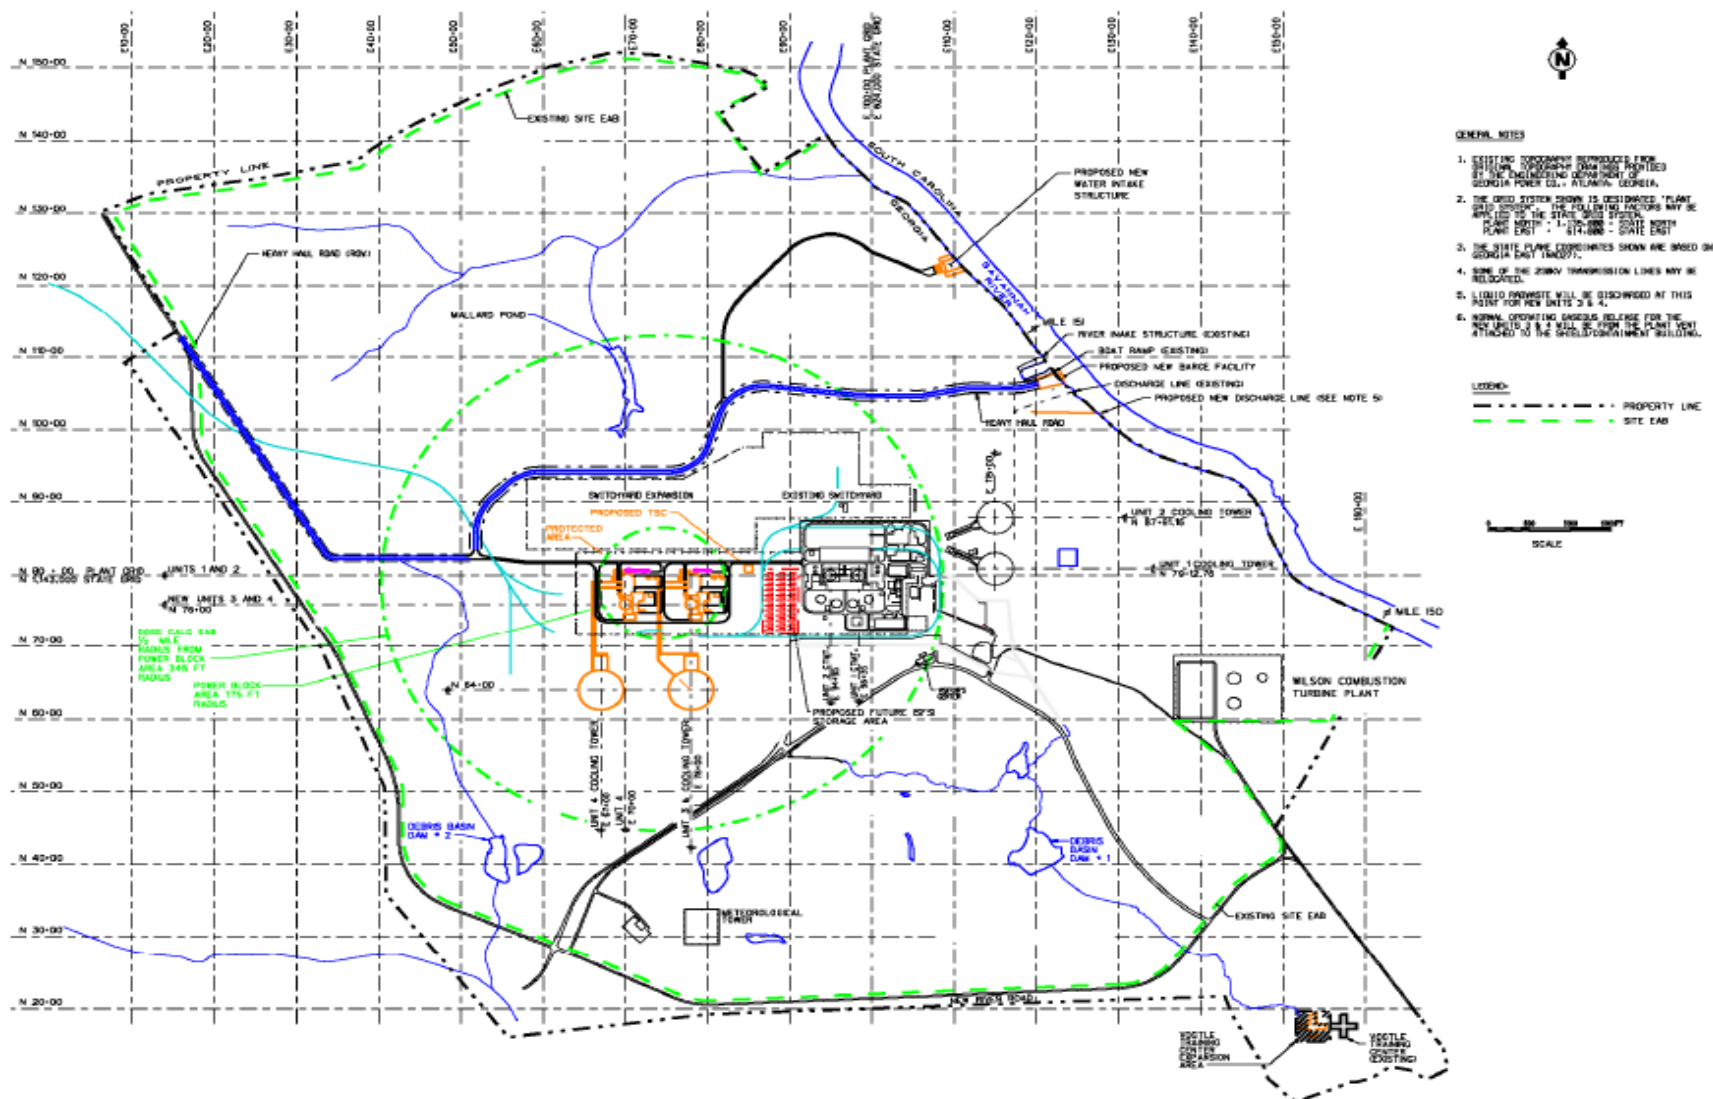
(Figure 2.4.14-1) – The proposed facility boundary for the VEGP site (Taken from SSAR Figure 1-4)
